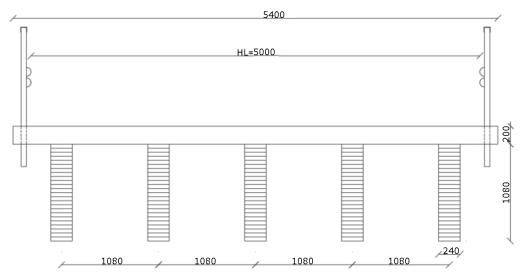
Dimensioned cross-section (all dimensions are in mm).
